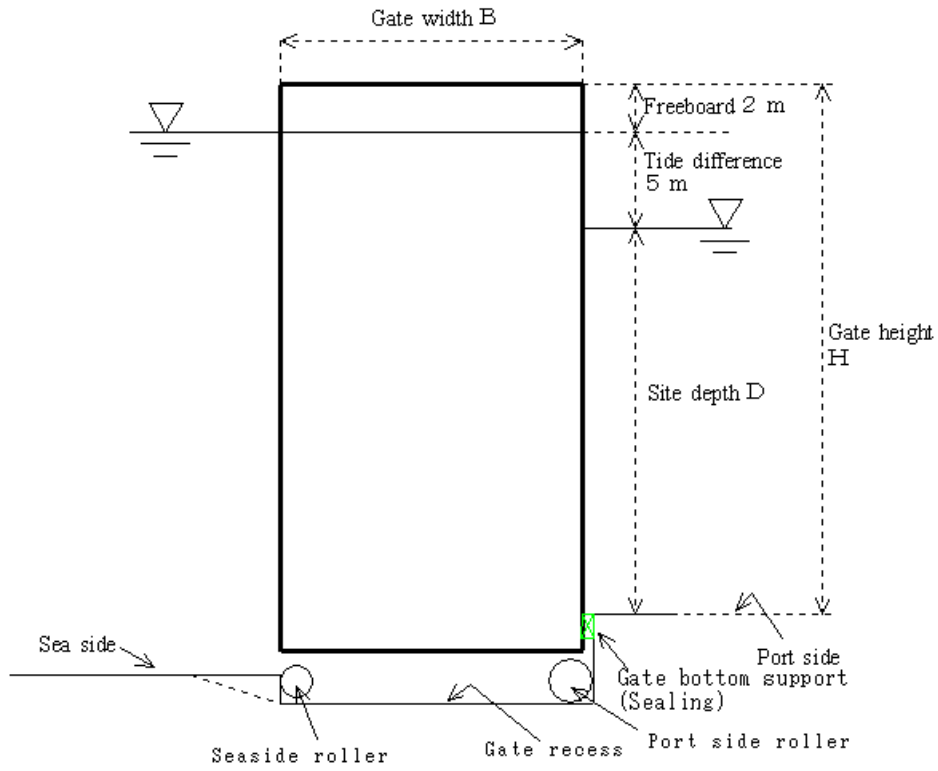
4 Bottom roller arrangement (Port side water tightness)
